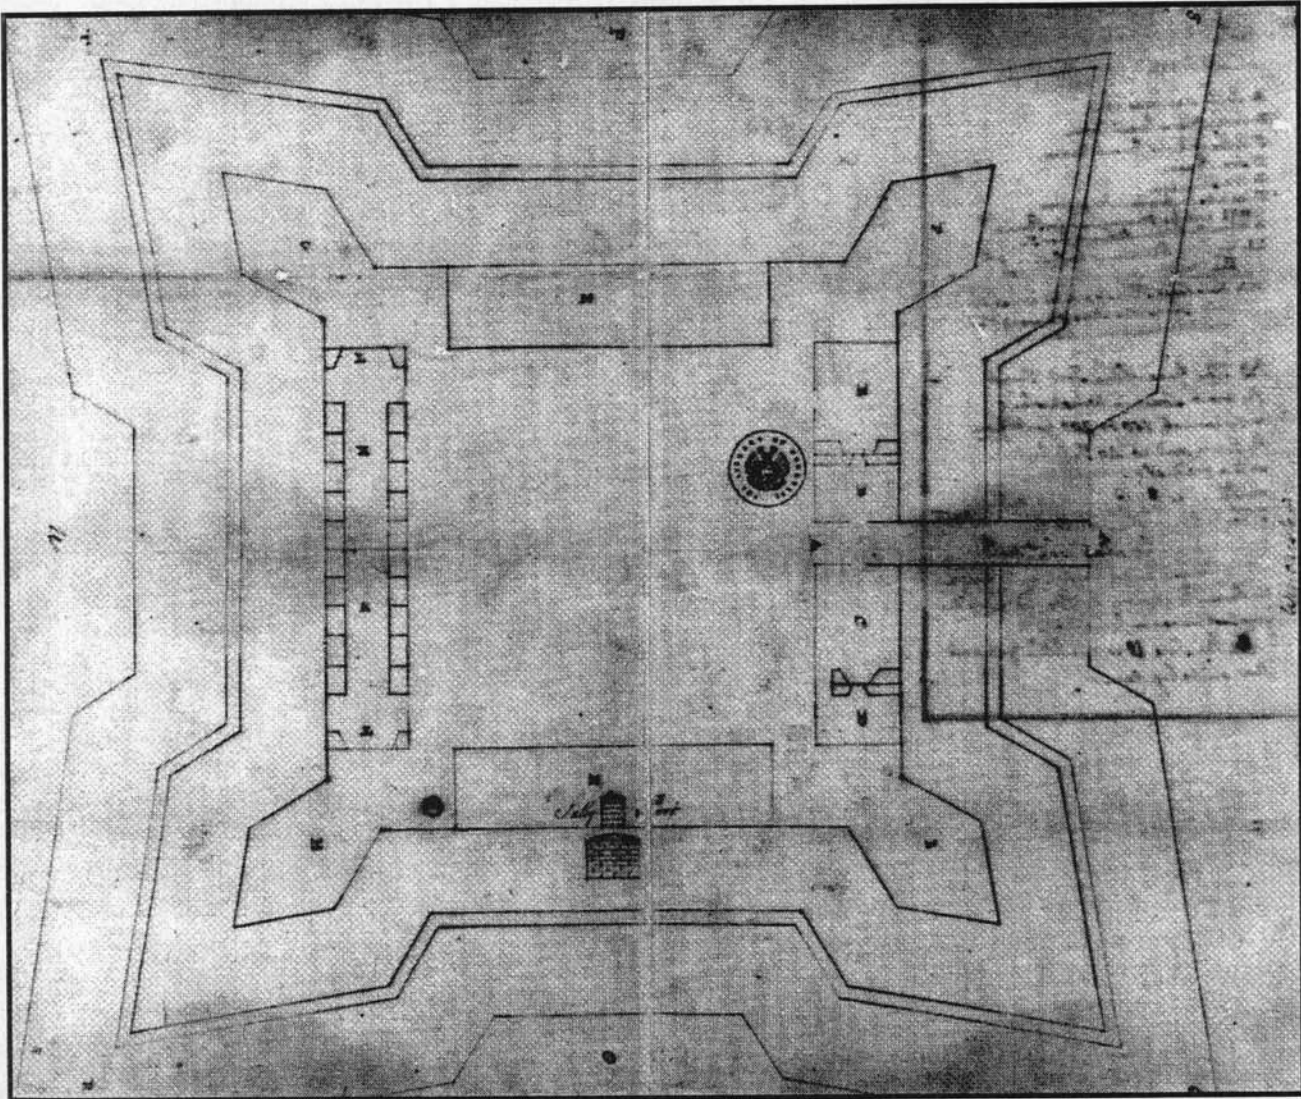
Washington's Second Design Plan for Fort Loudoun.
